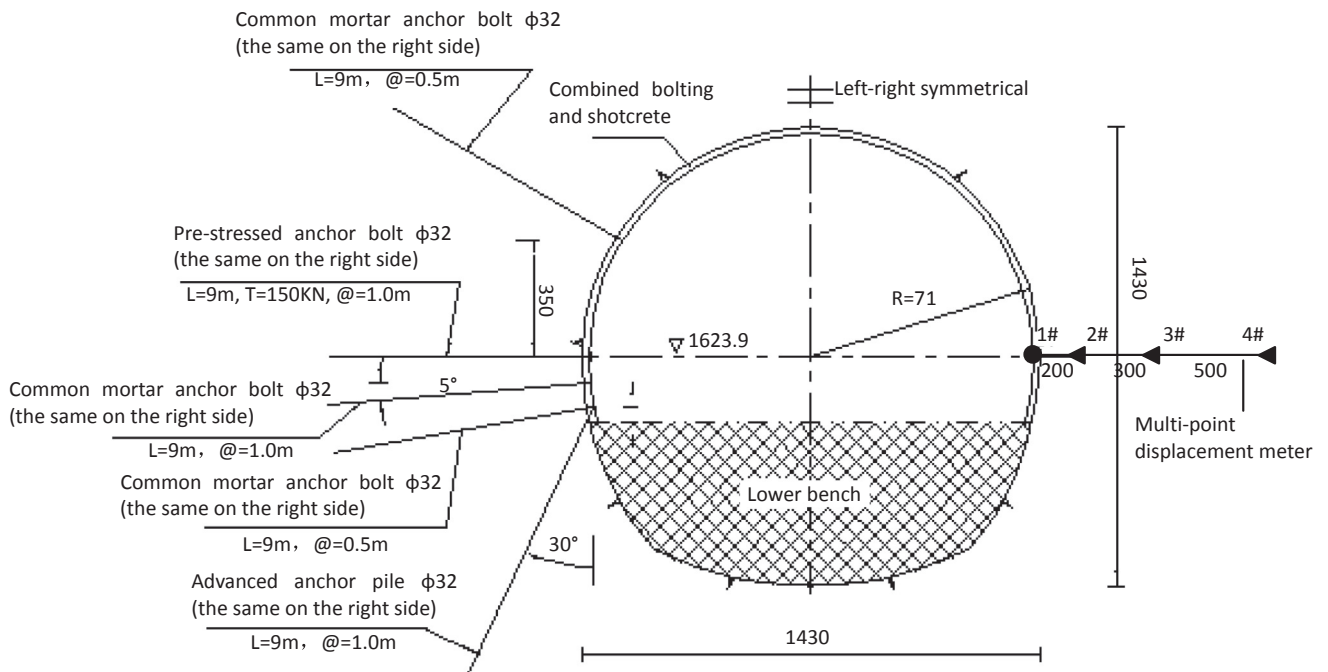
Support reinforcement scheme and displacement monitoring layout of the chlorite schist section (cm). Φ : diameter; L: length; @: spacing; T: pre-stress; R: tunnel radius; ∇ : elevation;
